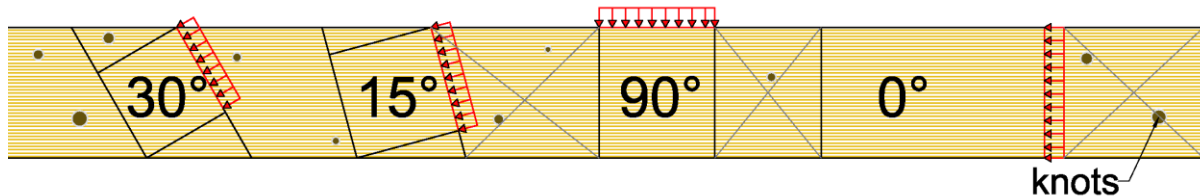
Sawing plan of the specimens in the C24 timber beam.
